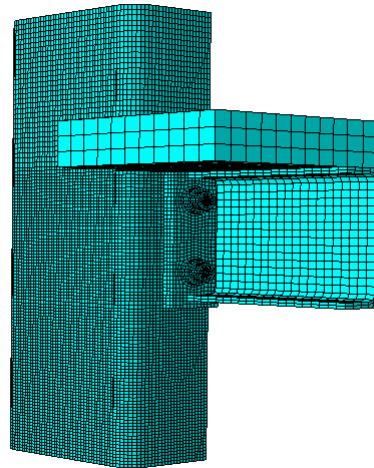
FE model of the connection between an I-beam and a hollow section column [97]
